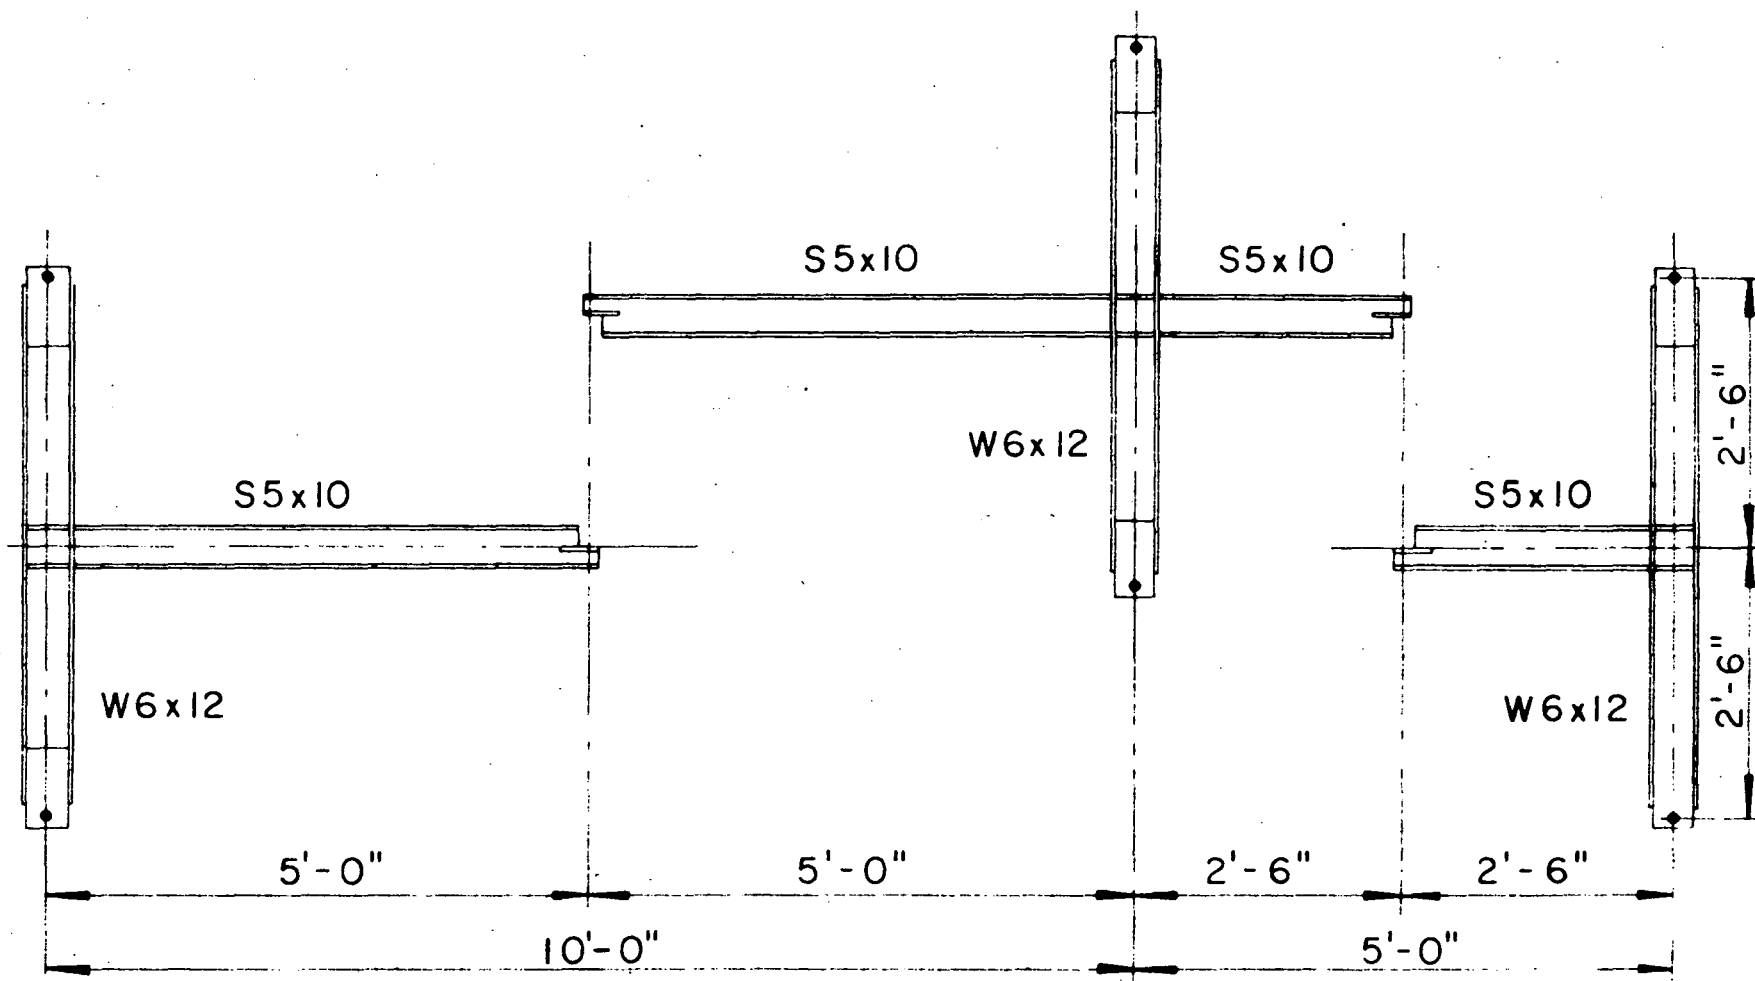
TYPICAL ONE STORY SUBASSEMBLAGES
